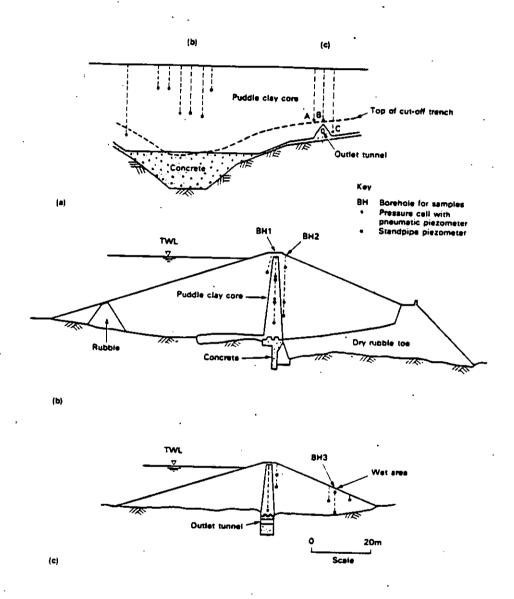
Gorpley dam: (a) longitudinal section; (b) transverse section at centre of dam; (c) transverse section at outlet tunnel
